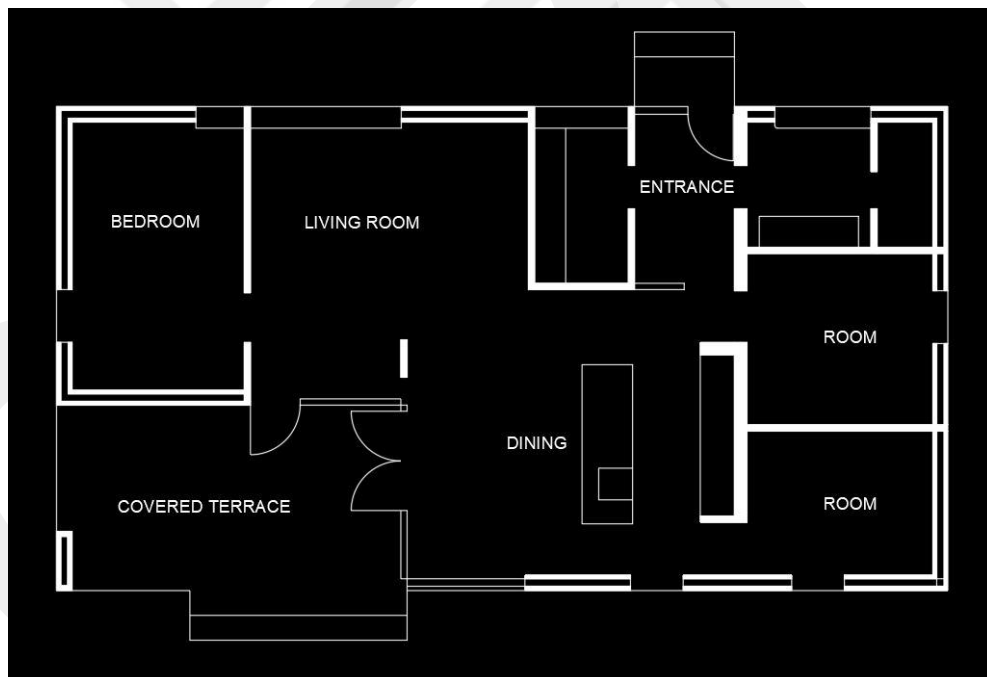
MIMA house floor plan, redrawn by the author (P-31, Table 4.1.1 & 4.1.2)
